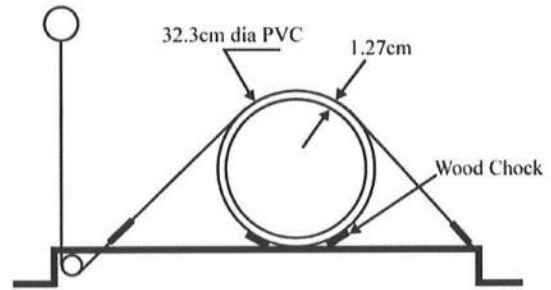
Cross-sectional Layout of Plan 2 Structure
